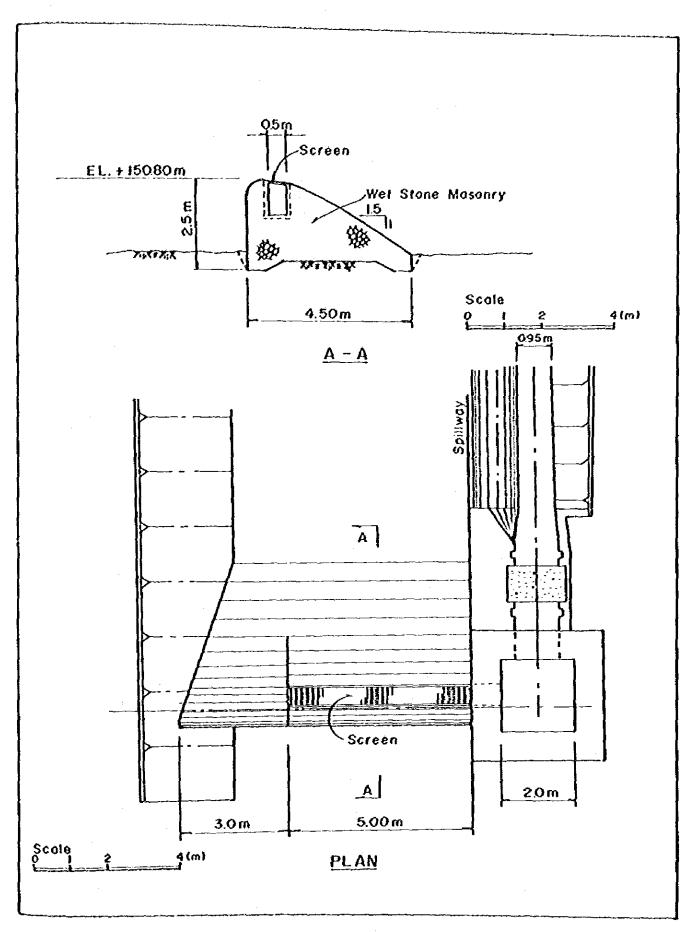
TYPICAL SECTION OF MACINAGA INTAKE WEIR
